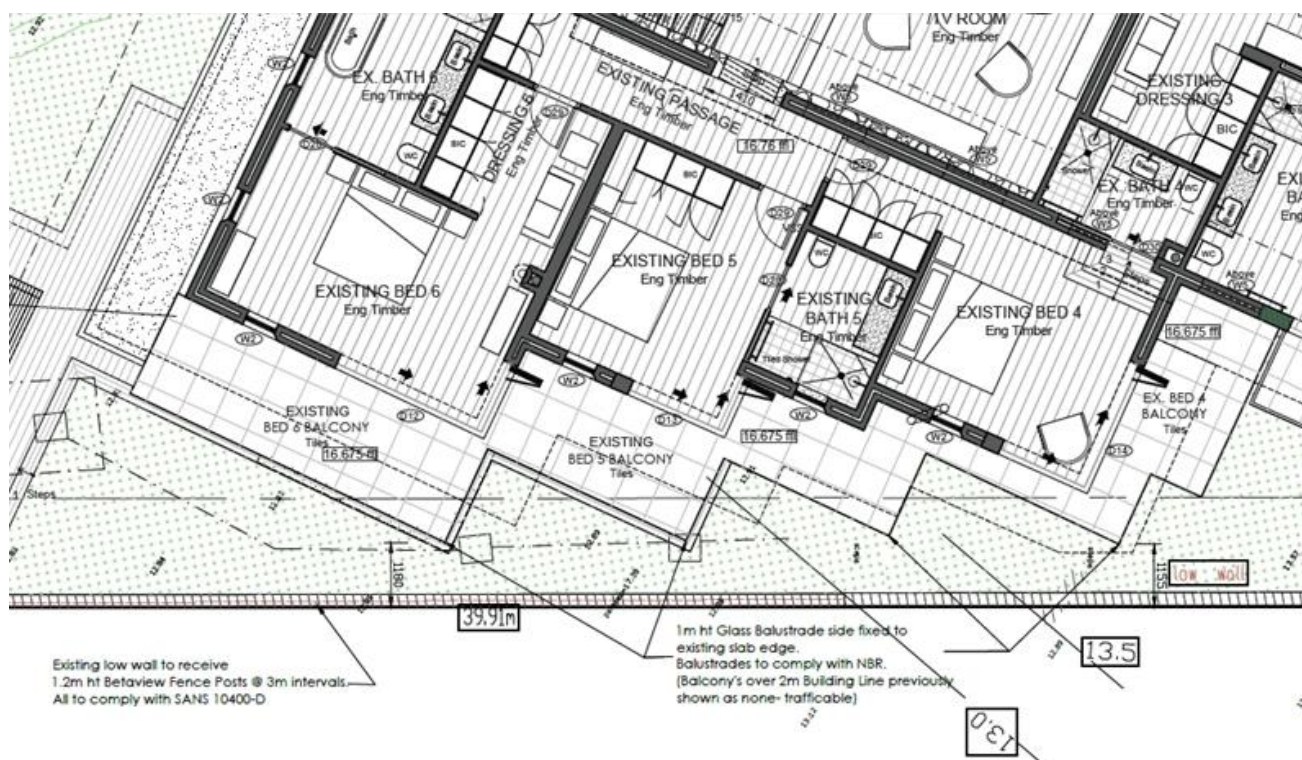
Proposed site development plan (second storey layout) indicating as-built accessible (trafficable) balconies over the 2m western lateral building line
